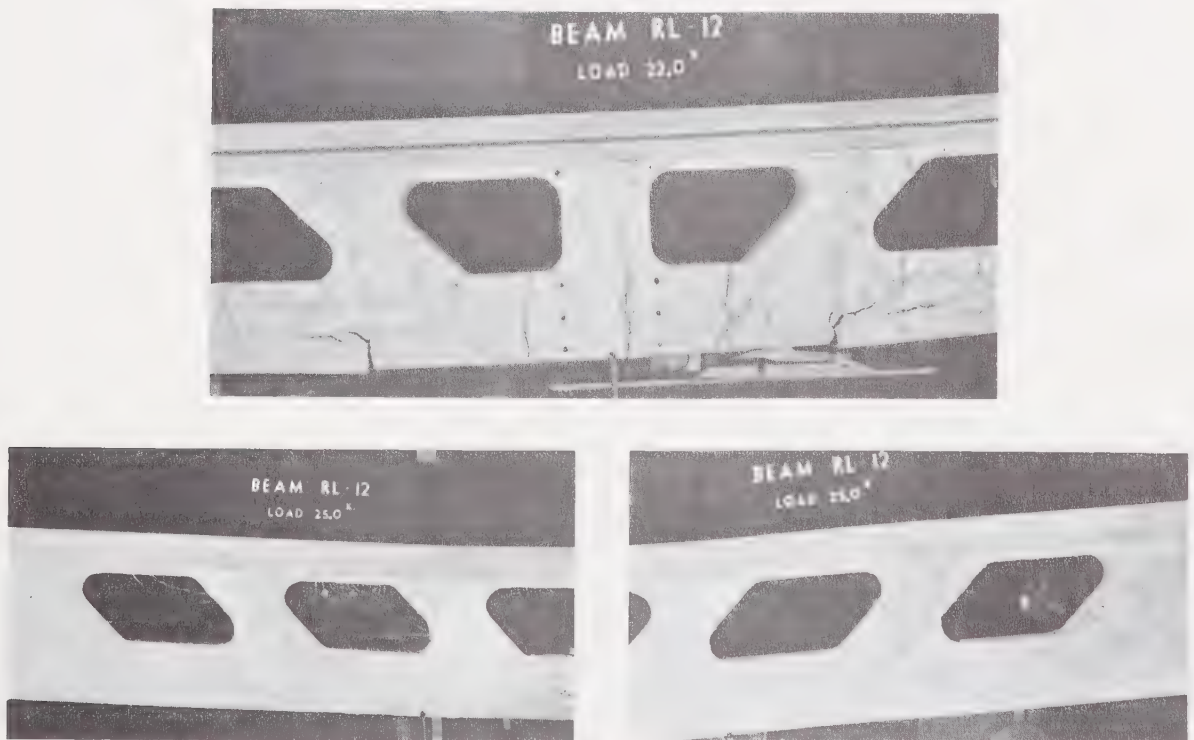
CRACKING AND FAILURE PATTERN OF BEAM 12-16-6-P
